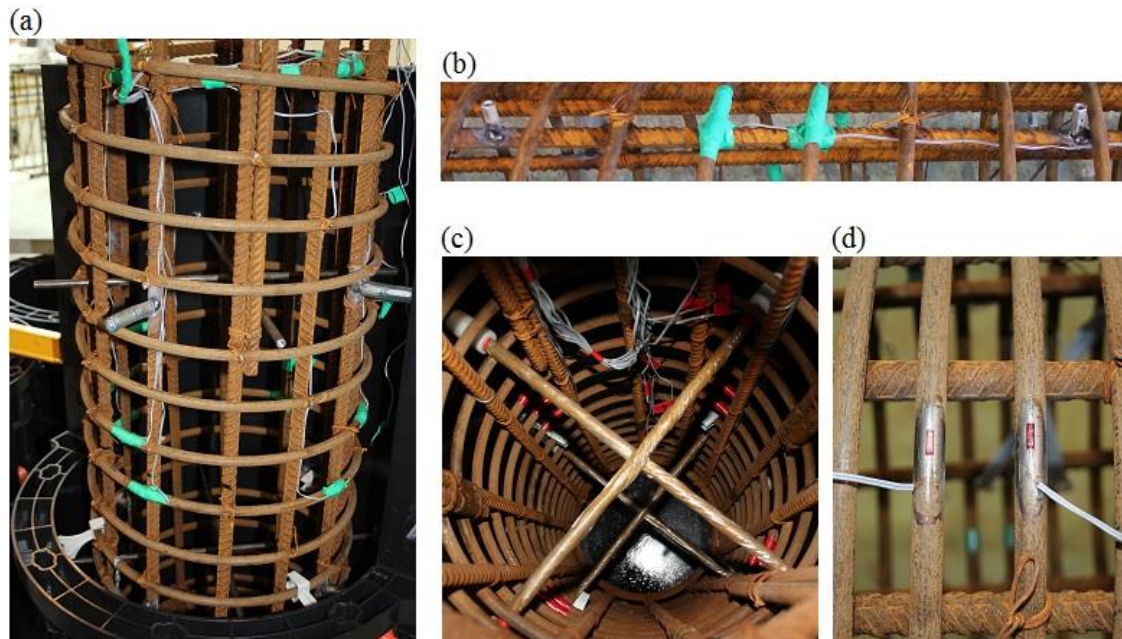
(a) Reinforcement and instrumentation details of circular columns; (b) Coupling nuts welded to longitudinal steel reinforcement; (c) steel rods passing through concrete core; (d) Strain gauges installed on transverse steel reinforcement
